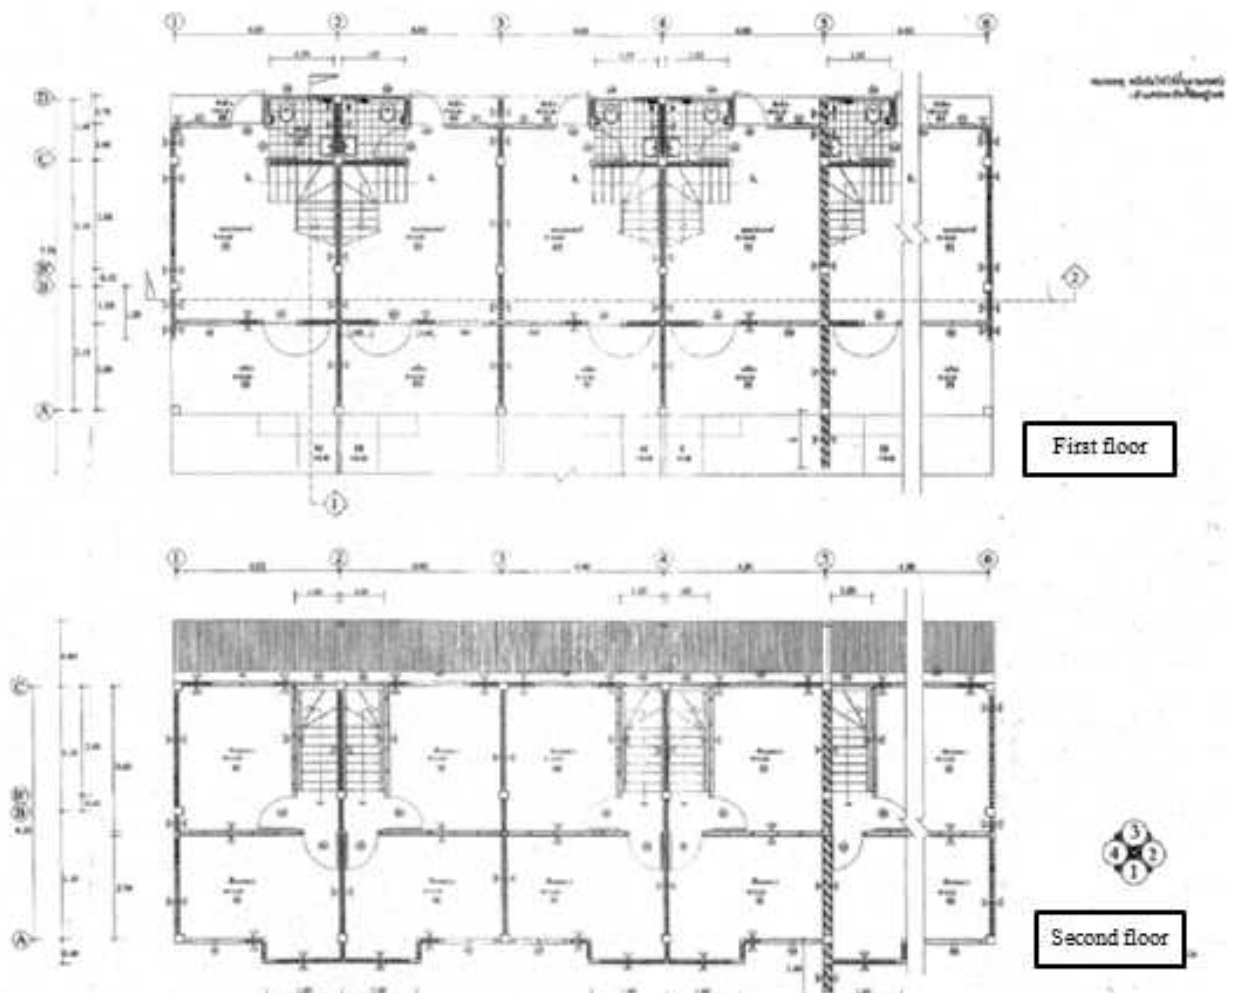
Floor plans of the NHA townhouse: first floor and second floor.
